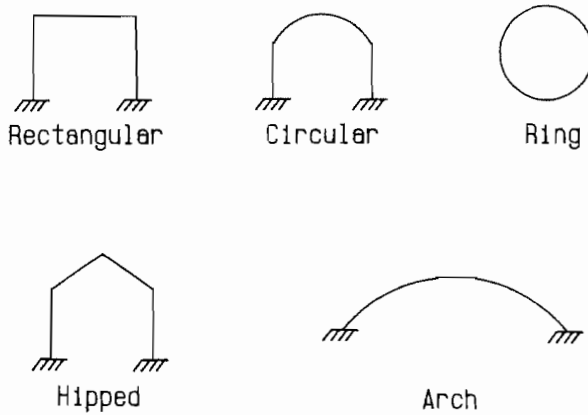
The Common Underground Structural Elements - Bent, Ring, and Arch.
